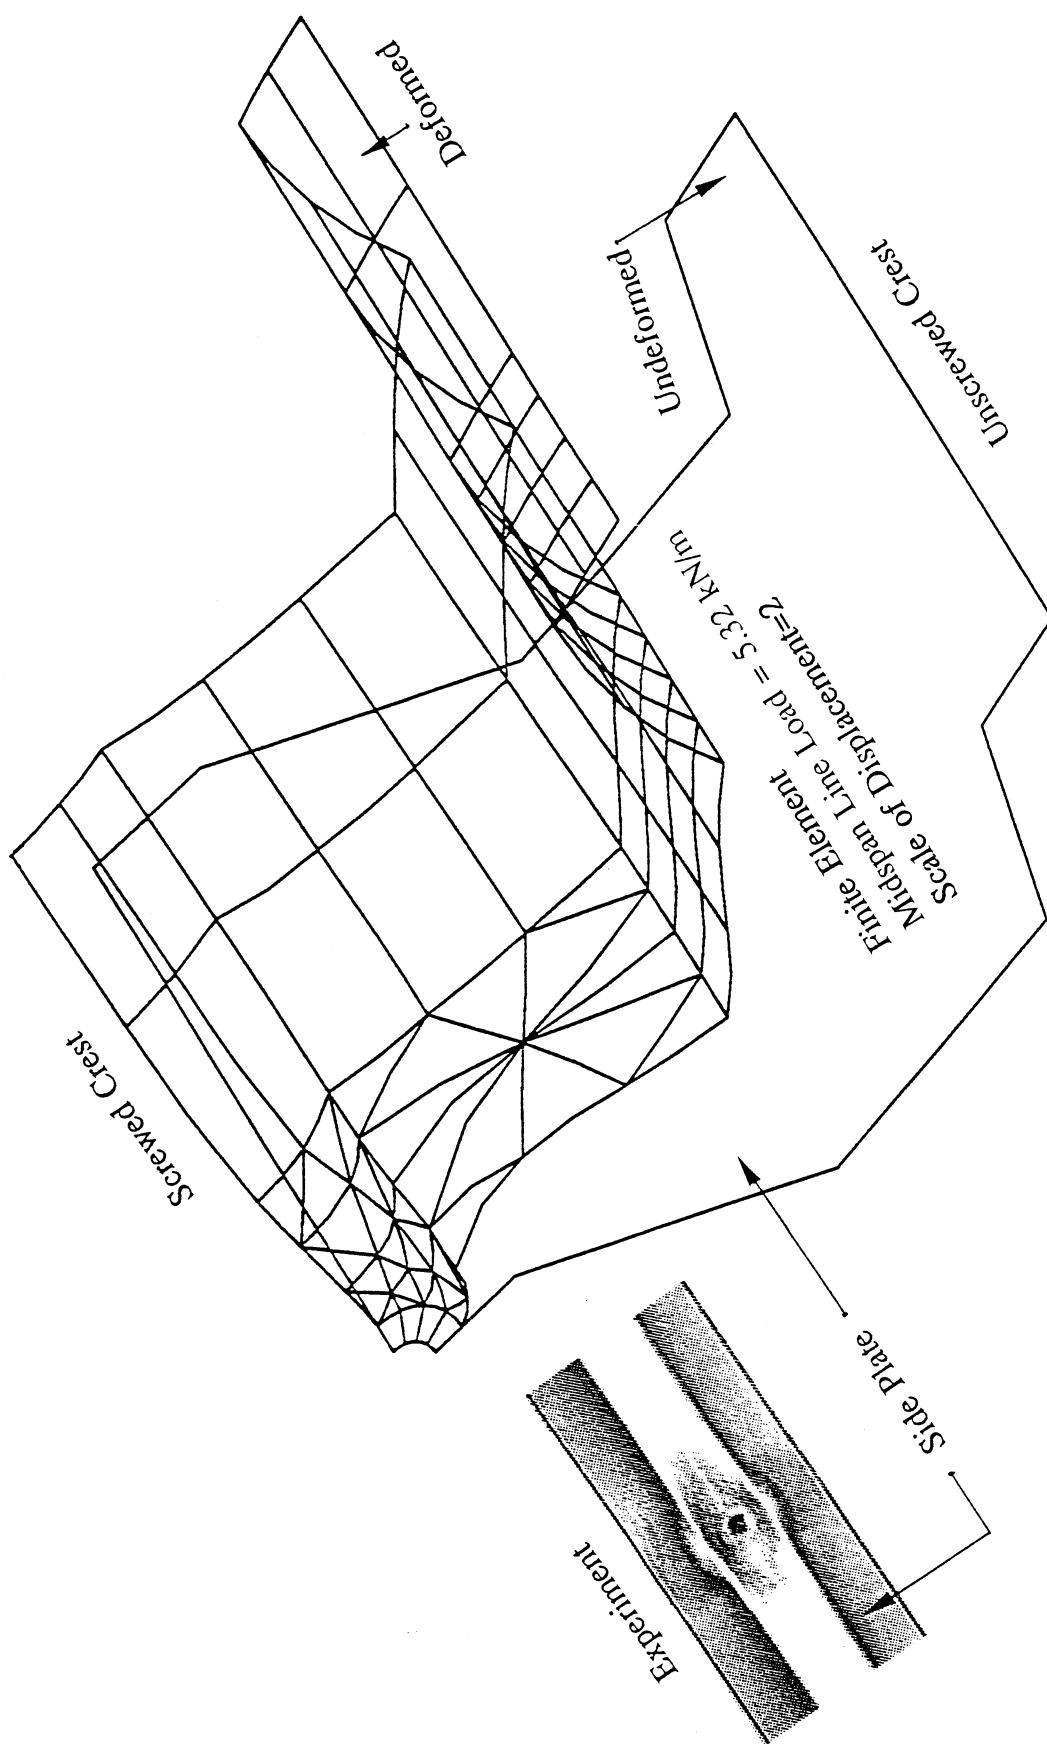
LOCAL DEFORMED SHAPE AROUND CENTRAL SUPPORT FASTENER HOLE: TRAPEZOIDAL PROFILE ROOFING SHEET
